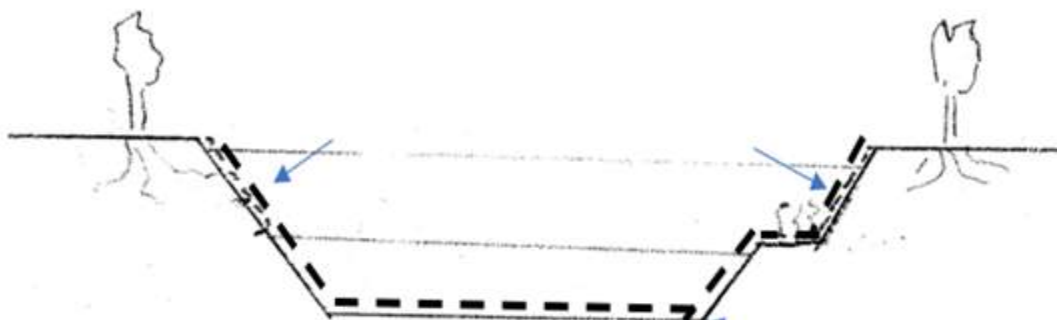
[Sample]: Partly Concrete mat Ceiling (embankment protection and bottom solid concrete ceiling)
